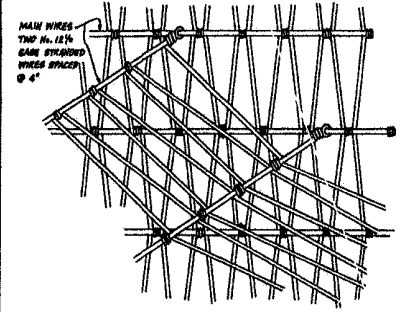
DETAIL OF WIRE FABRIC AND NORMAL SPLICE
